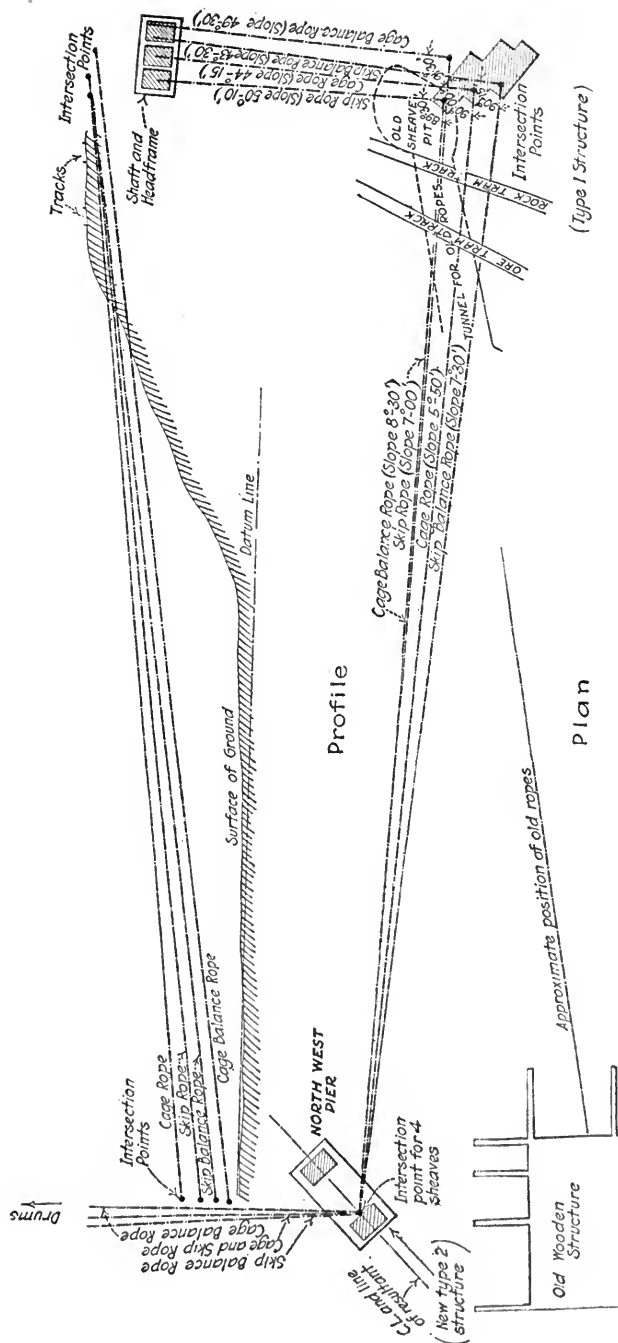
LAYOUT OF ANGLE-SHEAVES AT "C" SHAFT, WEST VULCAN MINE.
